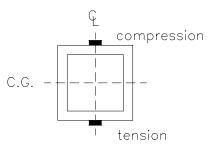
Strain Gage Locations for Bending Test on Box Sections (Midspan)
